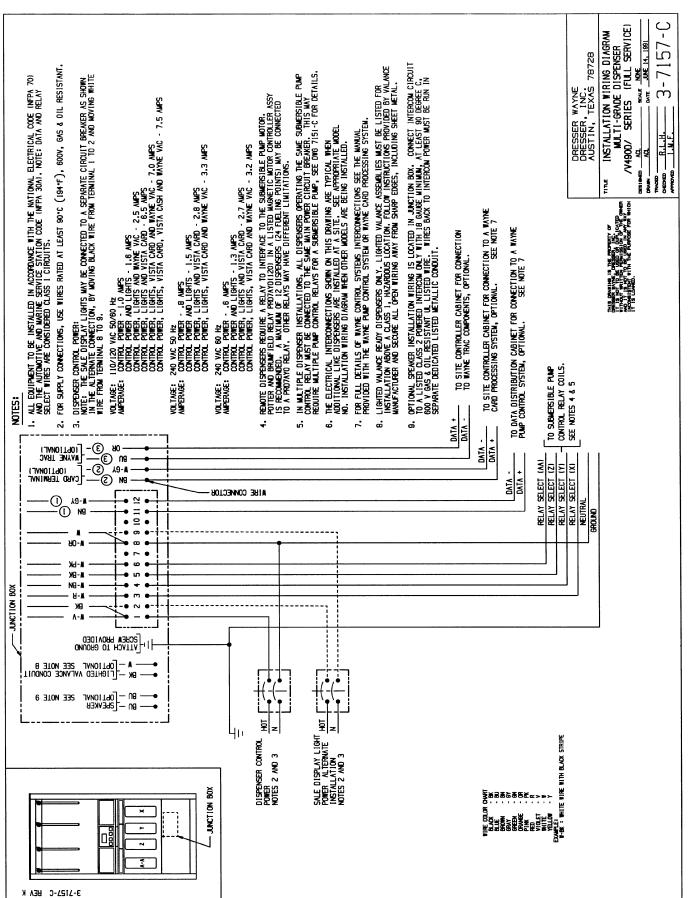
3-7157-C Installation Wiring - 4/V490D (Remote)
